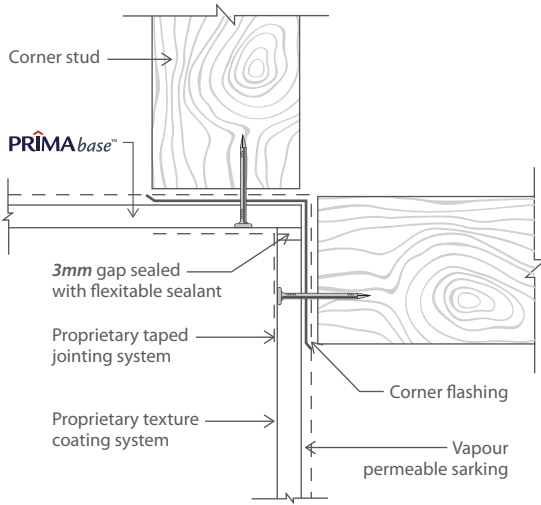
Internal Corner (Tape Reinforced Flexible Joint)
